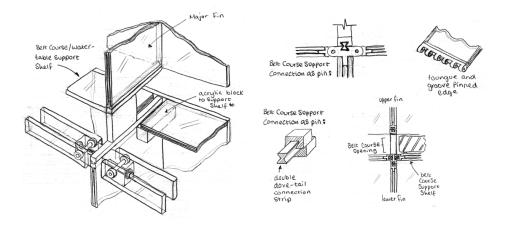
Stainless Steel Connection Junction at Floor Bearing Level.
